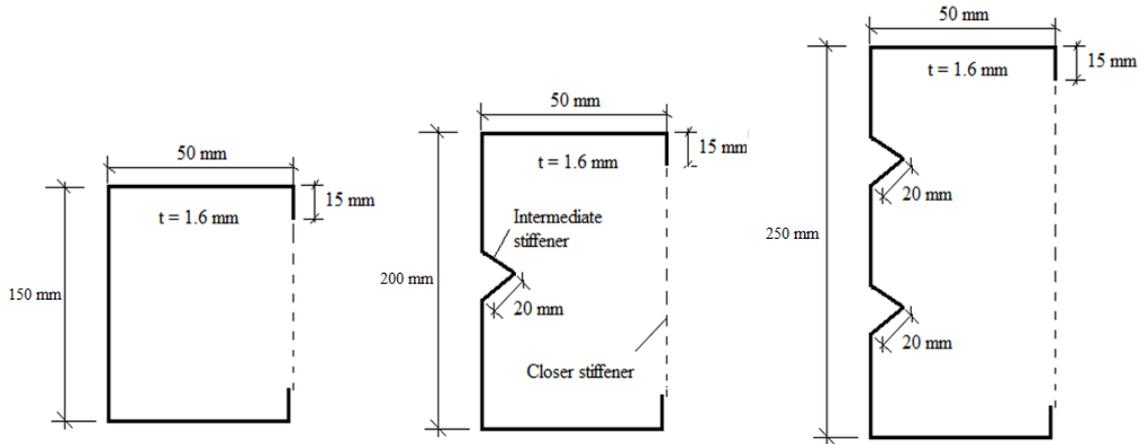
Geometry and cross – sectional dimensions of the specimen
